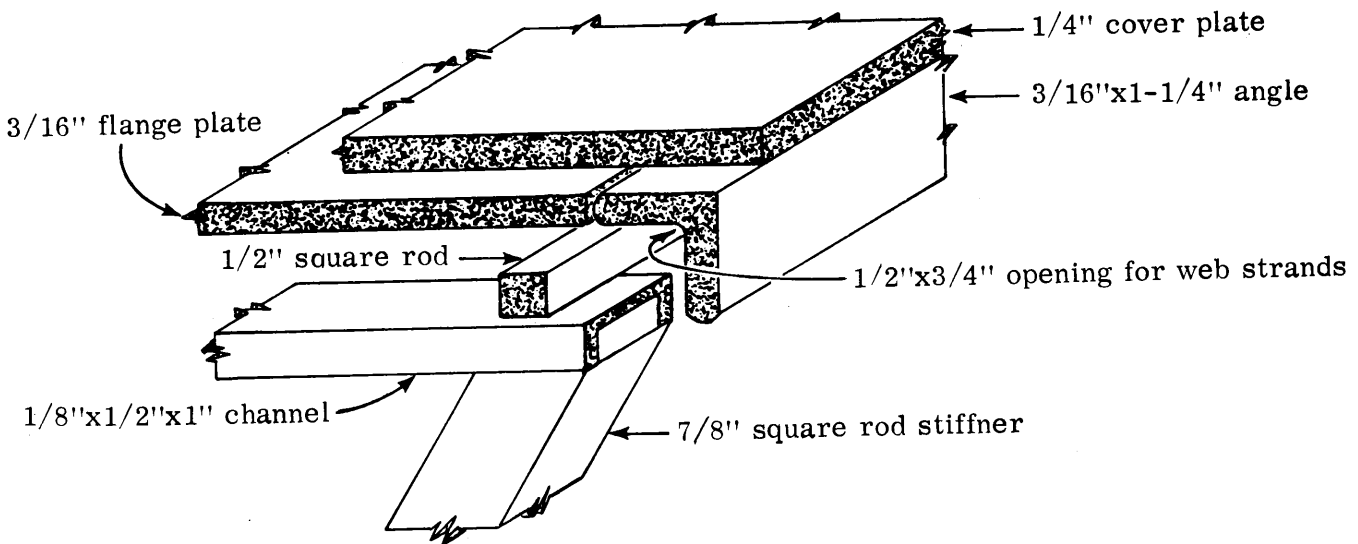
Top-flange assembly details of specimen TTG-4R. Basic conversion unit: 1"=25.4mm.
